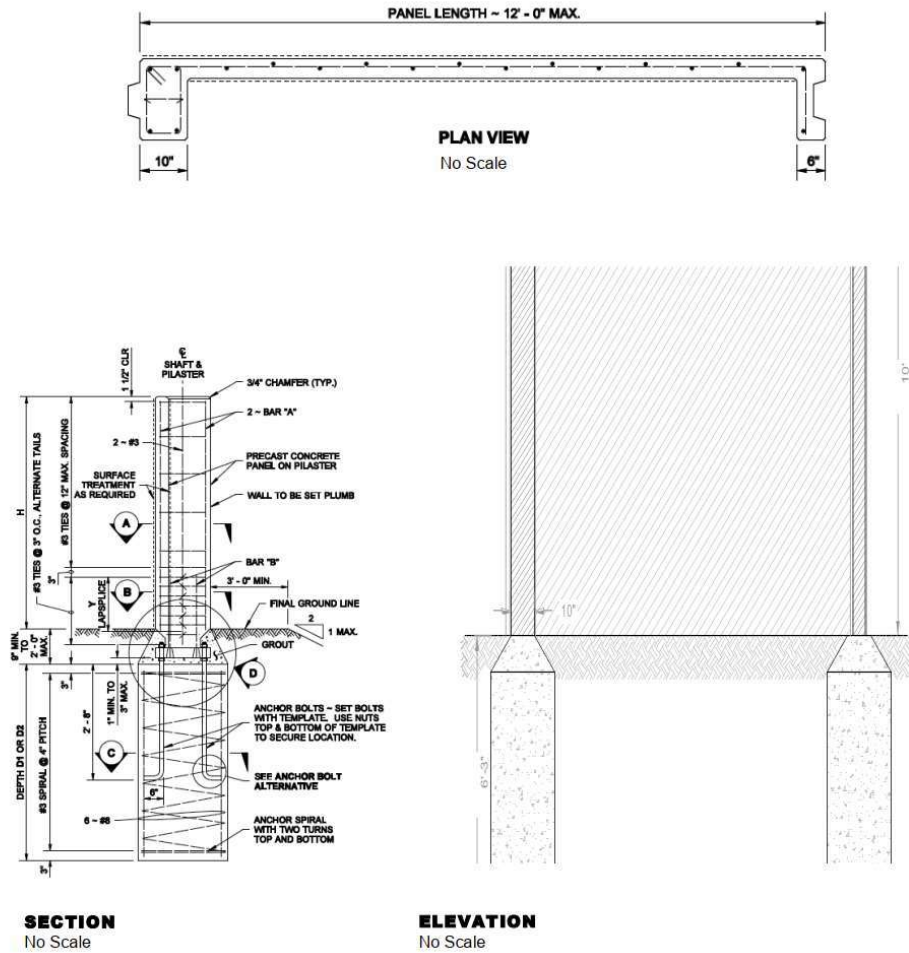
Standard details of Precast Concrete Wall on Shaft Foundation "Noise Barrier Wall Type 11", provided by WSNW and adapted by Maria Valdebenito
